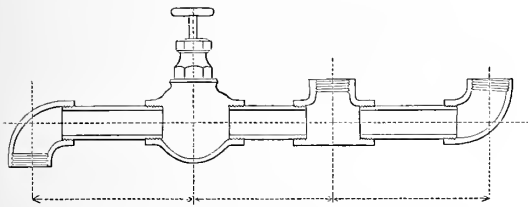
DIAGRAM SHOWING SCREWED JOINTS.
